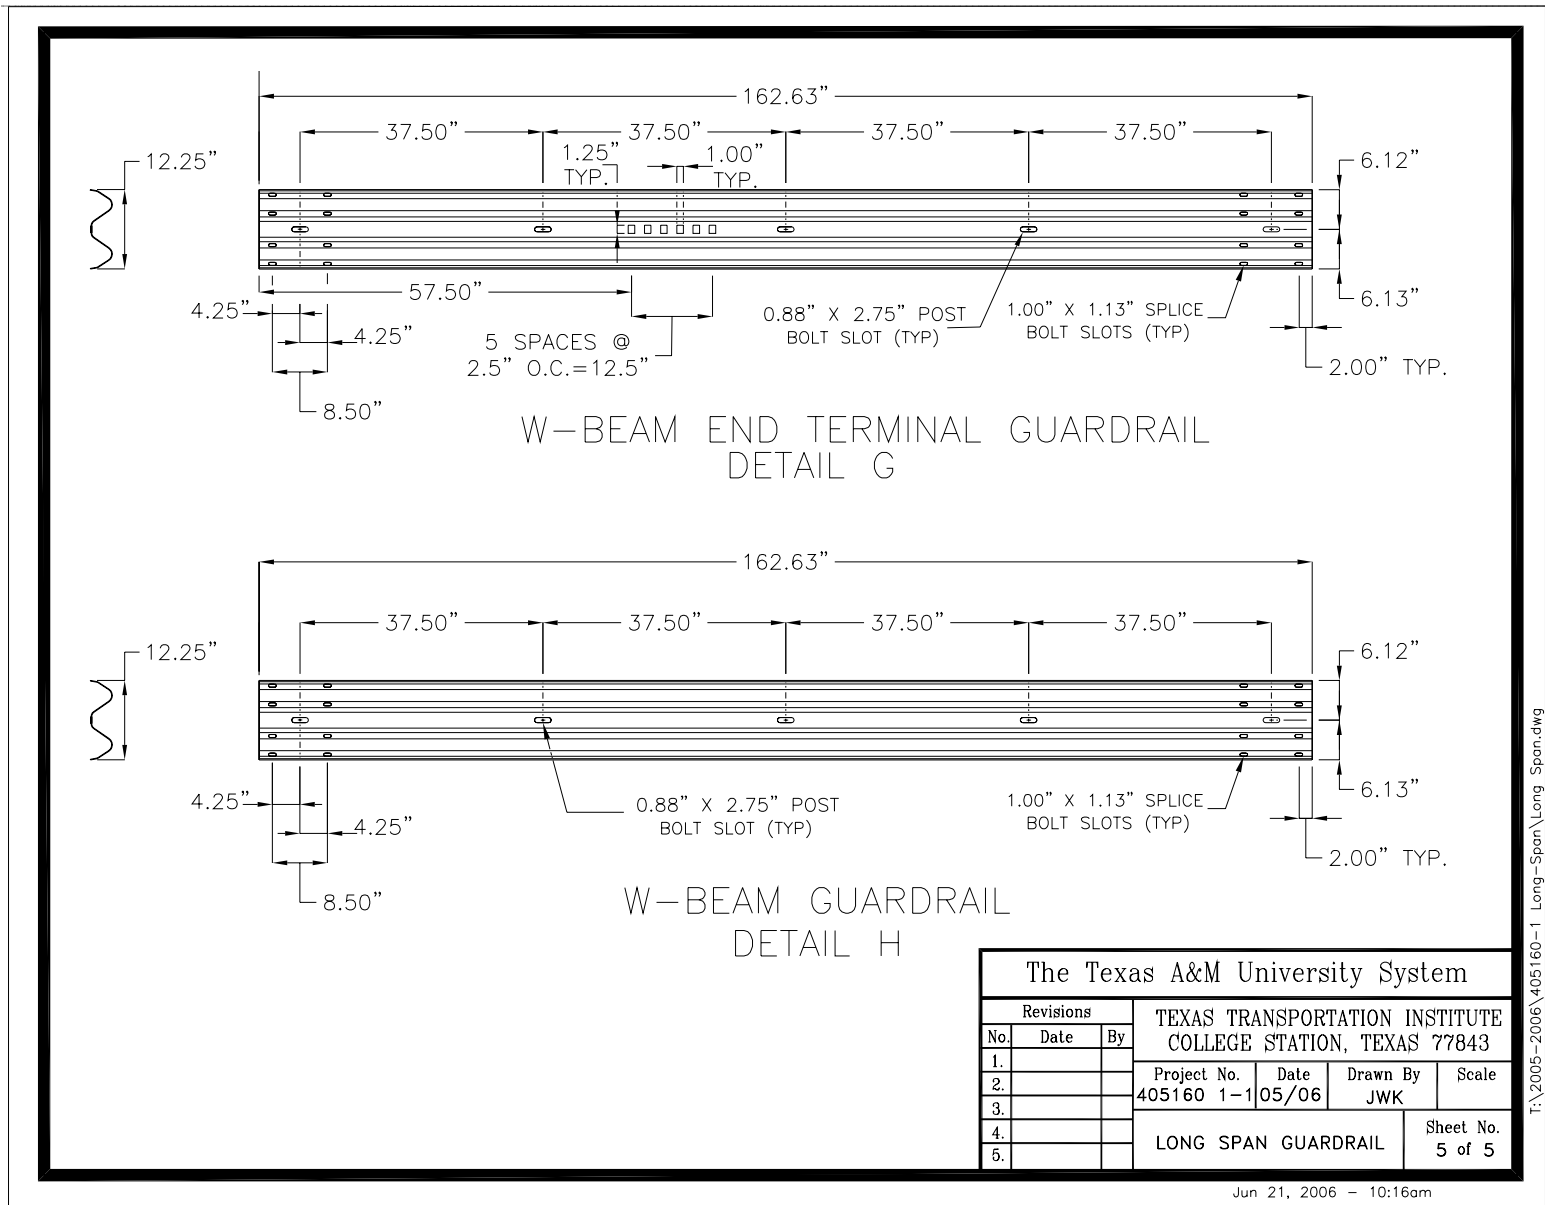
Details of the Long-Span Guardrail – W-beam details.
